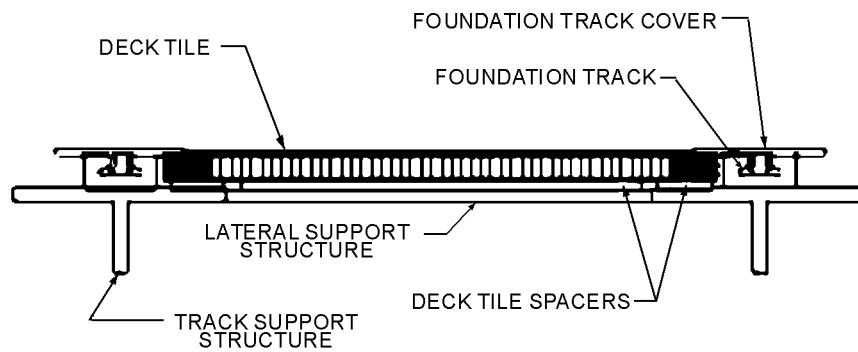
Deck Tile Assembly showing Tile Spacer and Track Cover Usage
